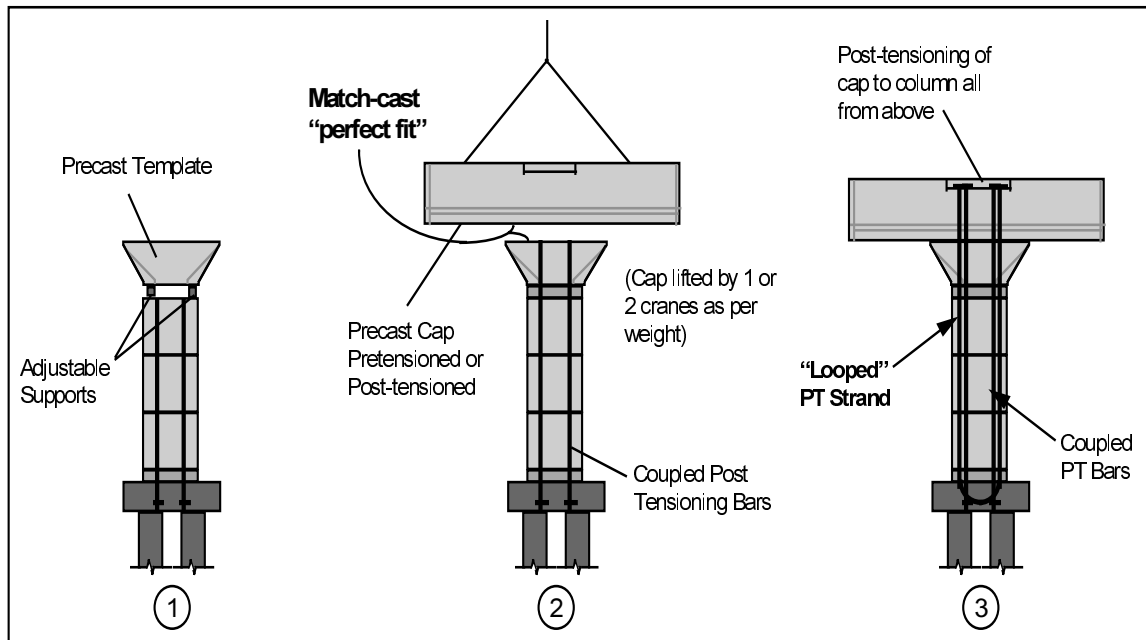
Erection sequence for a hammerhead bent with a single cap element
